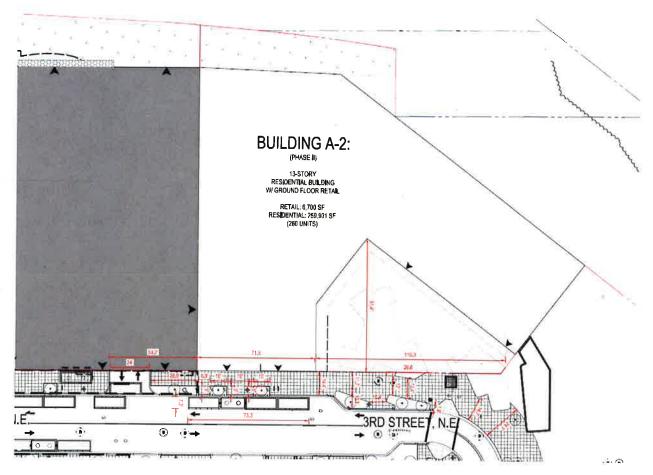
Building A2 Streetscape Design (Source: Applicant)
